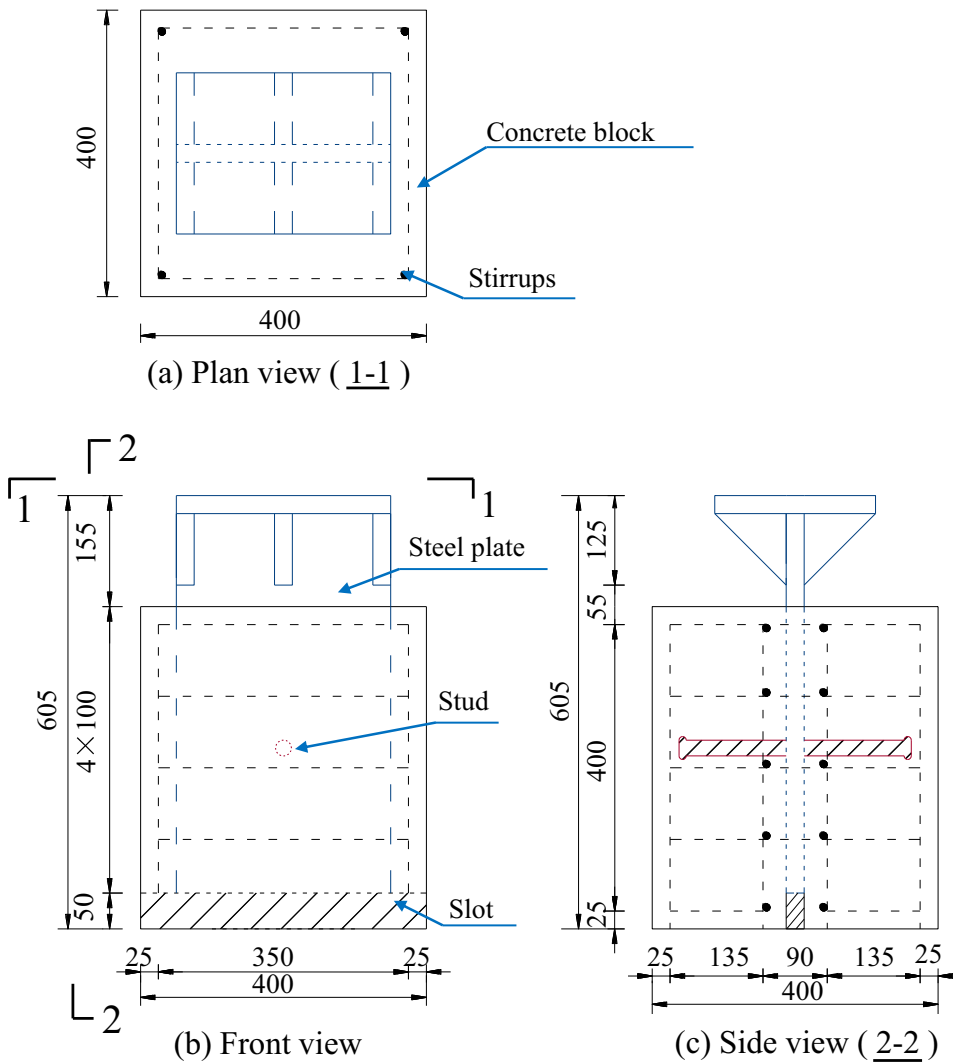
Geometry of the Plug-in Type Push-out Specimens (unit: mm).
